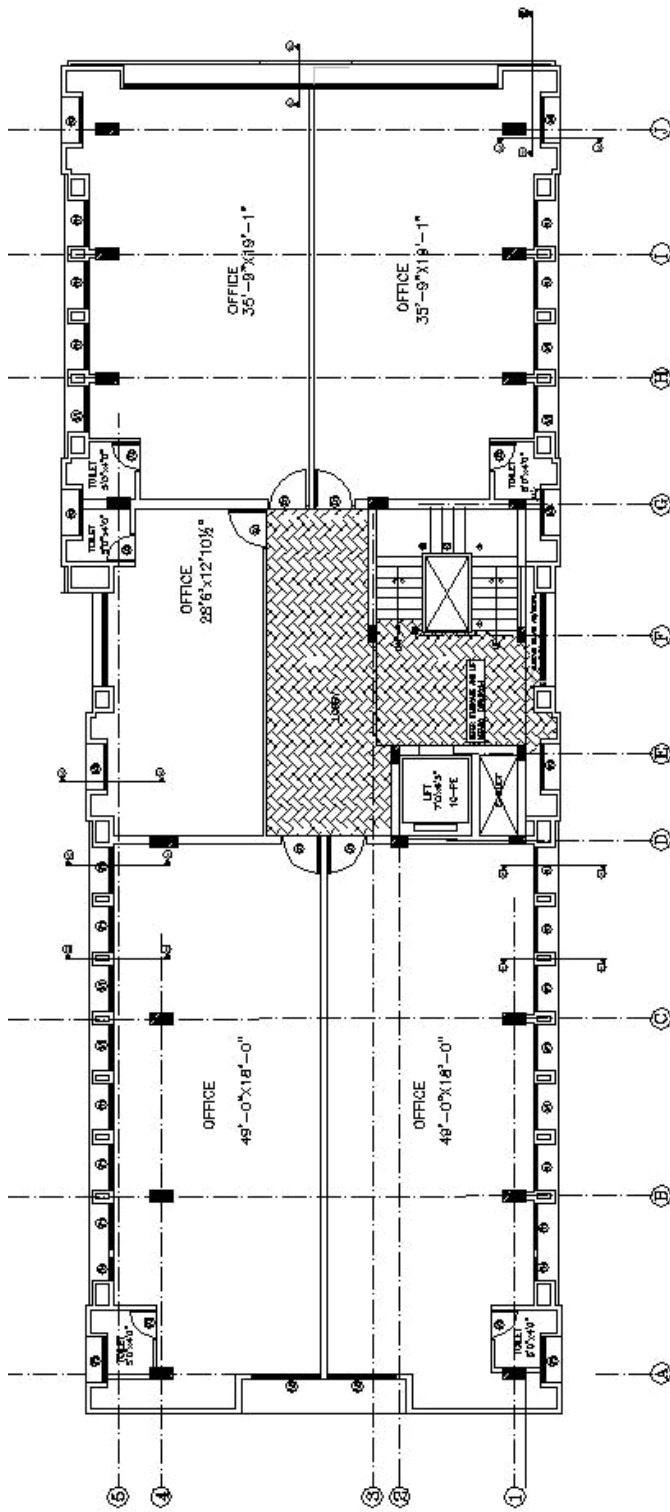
Mahavir Commercial Complex, Hyderabad: First Floor Plan
